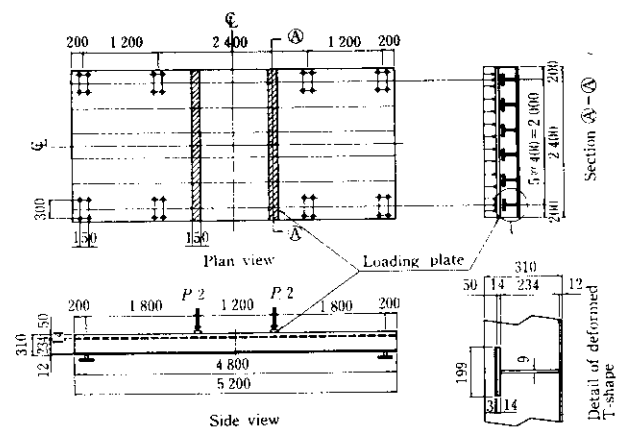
Dimensions of composite slab specimen for bending rupture test
